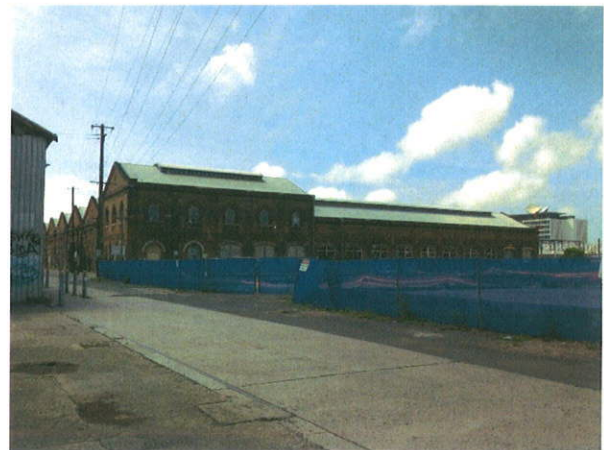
View of site from north-west with Carriage Works building in background (Source: EIS)
